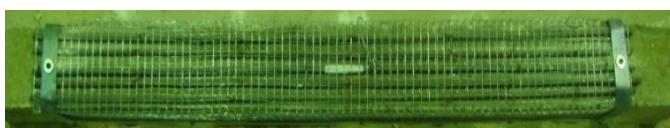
d] External additional horizontal steel bars 5Ø8 and two vertical steel clamps.
